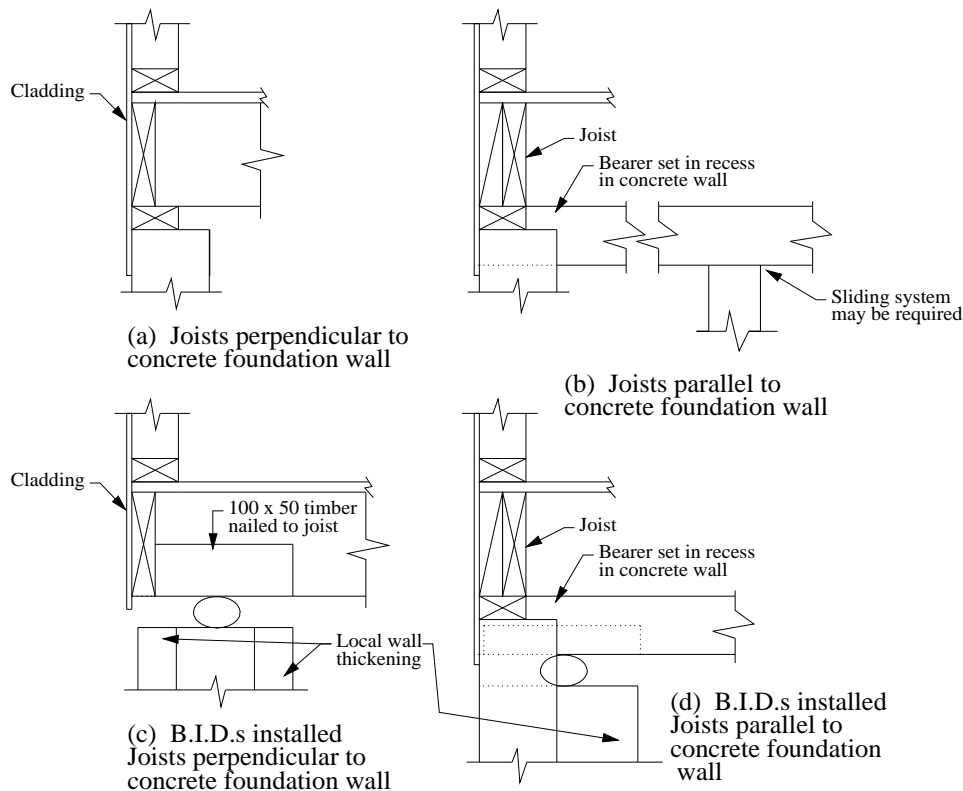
Perimeter isolation at houses with continuous concrete perimeter walls but piled in the interior space.
